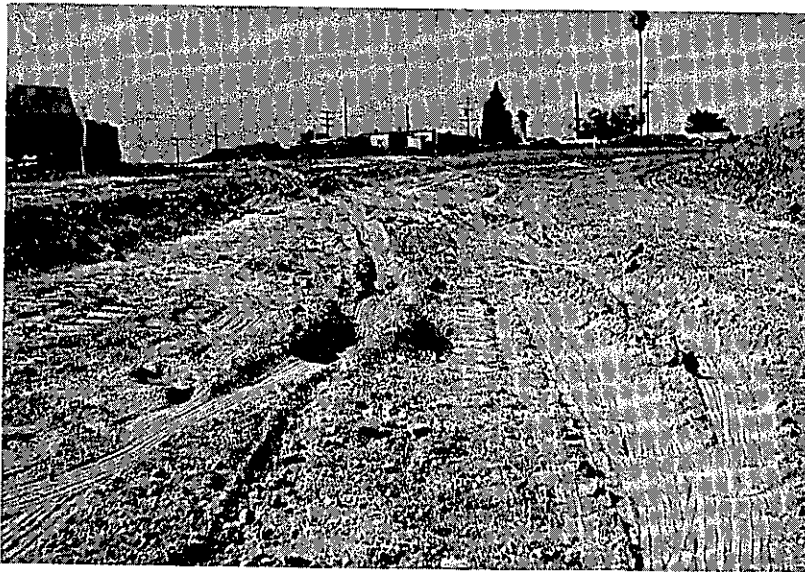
View of ground condition showing rut after Road Logger was rescued (PHOTO 20).
